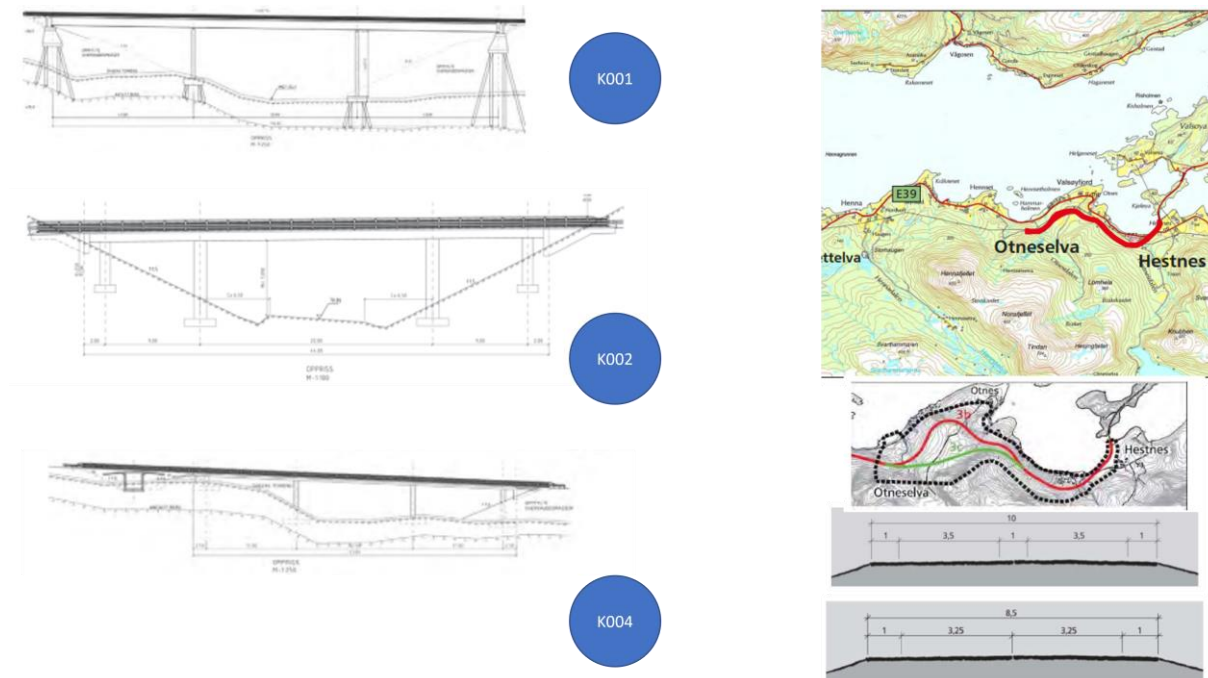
shows all bridges in the parcel Otneselva-Hestnes with zoning plan and 2 road sections H4 and H2
